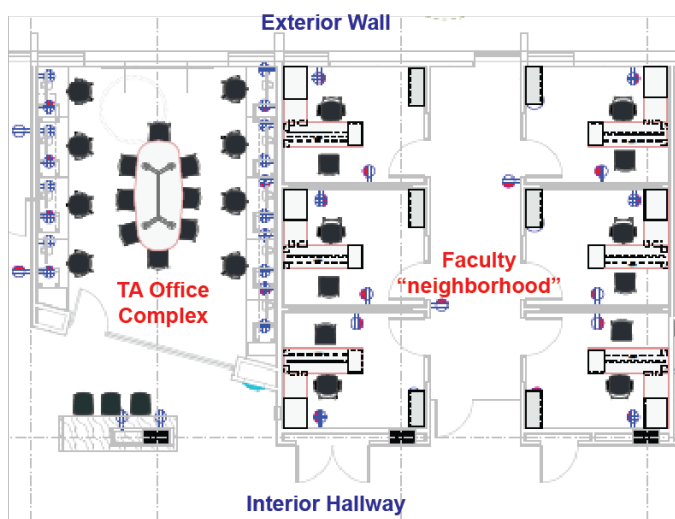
Floor plans of future TA Office complex and faculty “neighborhood”, MH 2nd floor.
